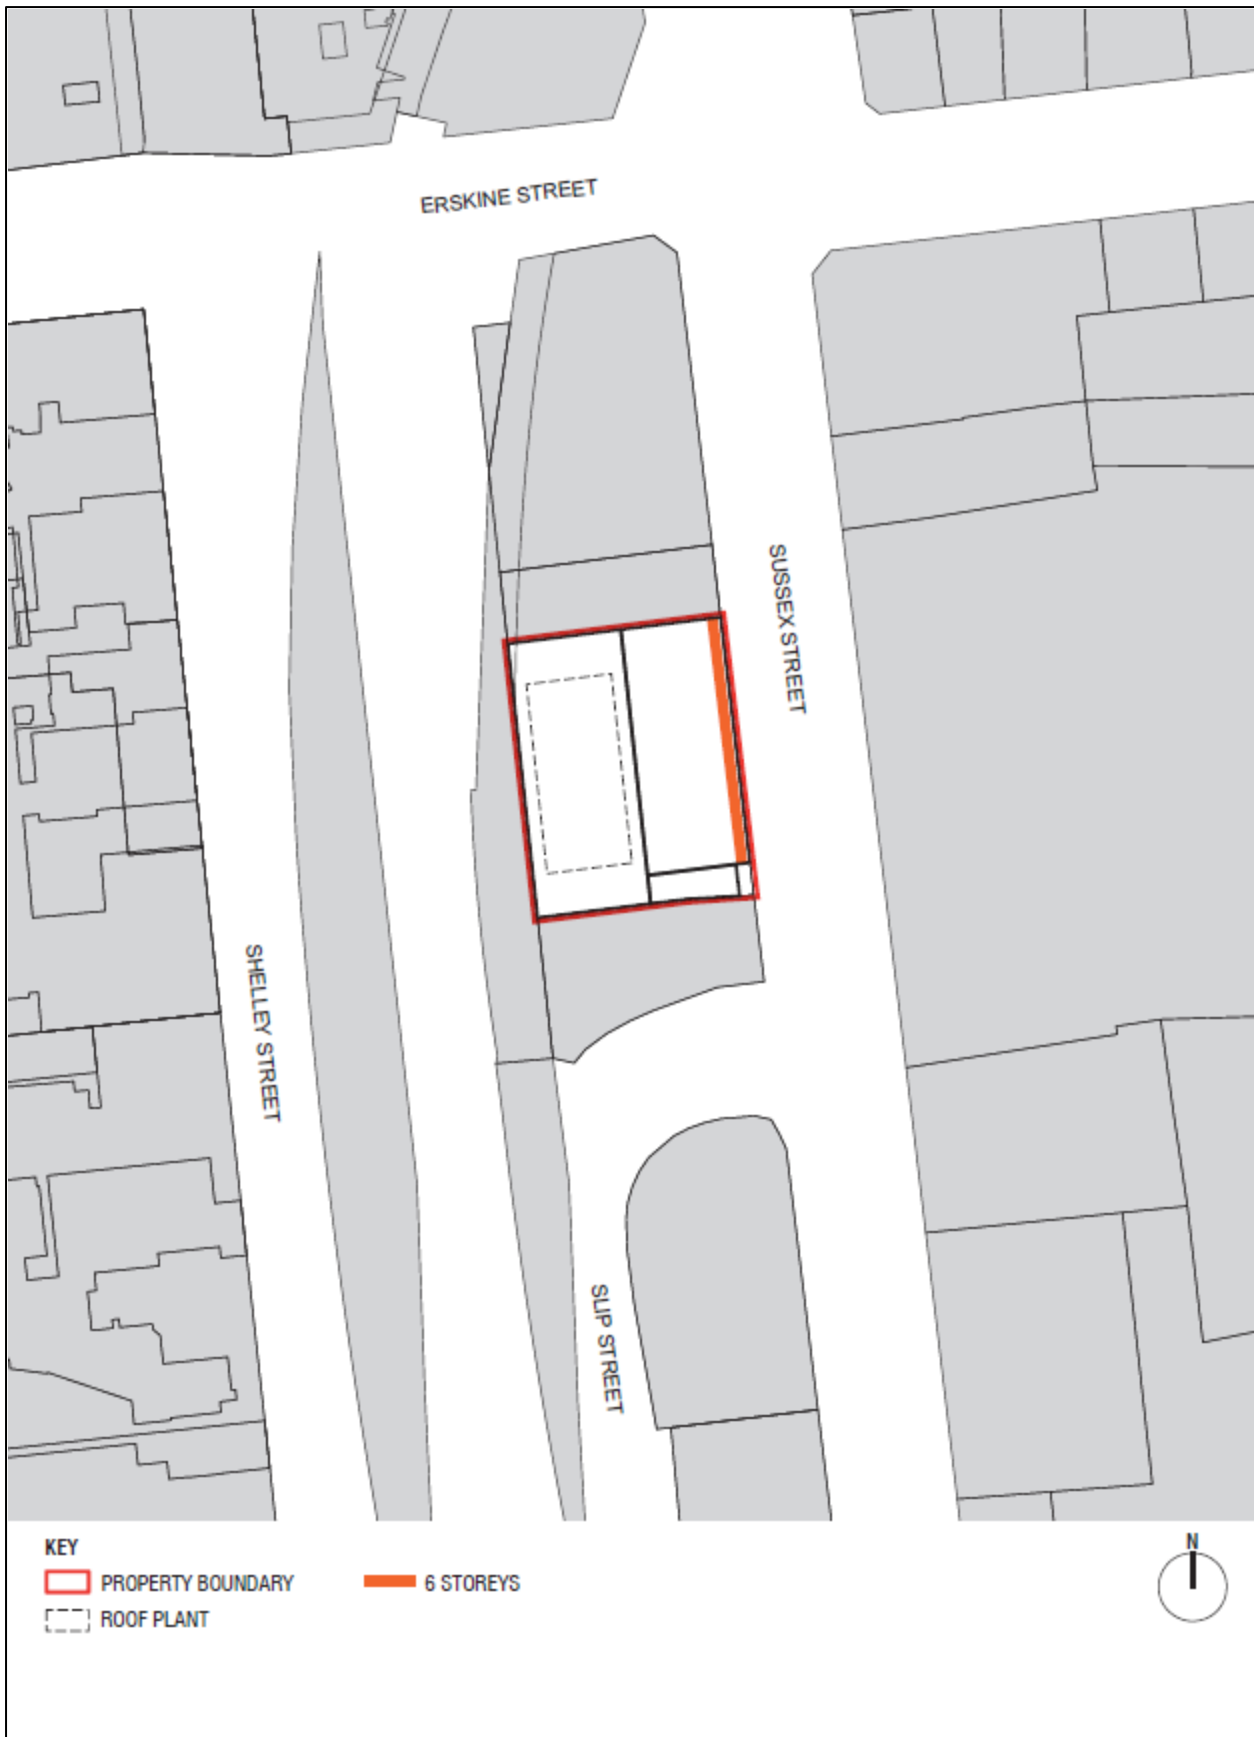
xx: 65-79 Sussex Street – Street frontage heights
